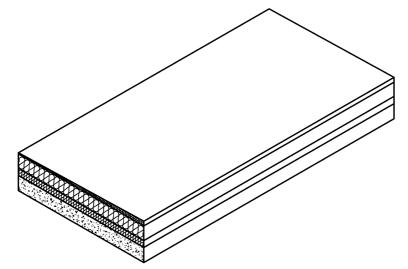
Traditional built-up roof (BUR) with rigid insulation
